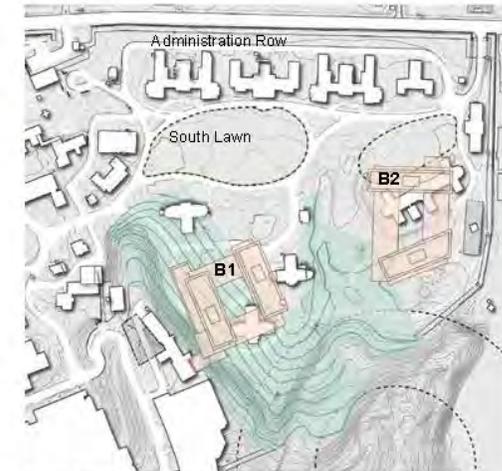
Preferred Alternative Plateau Site Development overlaid on existing conditions and potential soil layback zone
